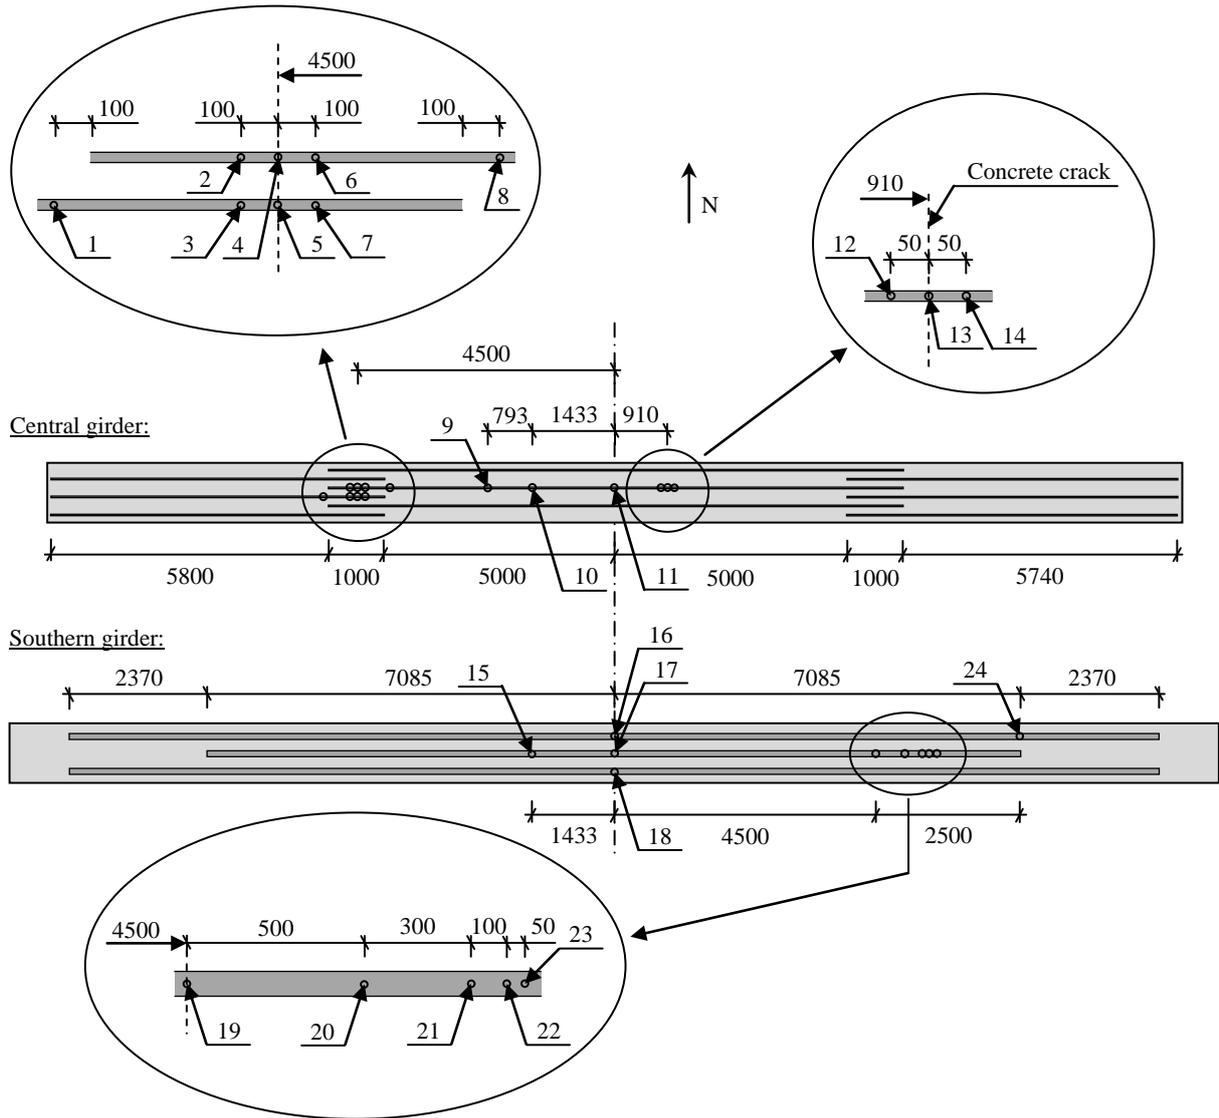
Geometry of bridge strengthening systems in span 2-3 and positions of the strain gauges on the NSM CFRP rods and prestressed CFRP laminates.
